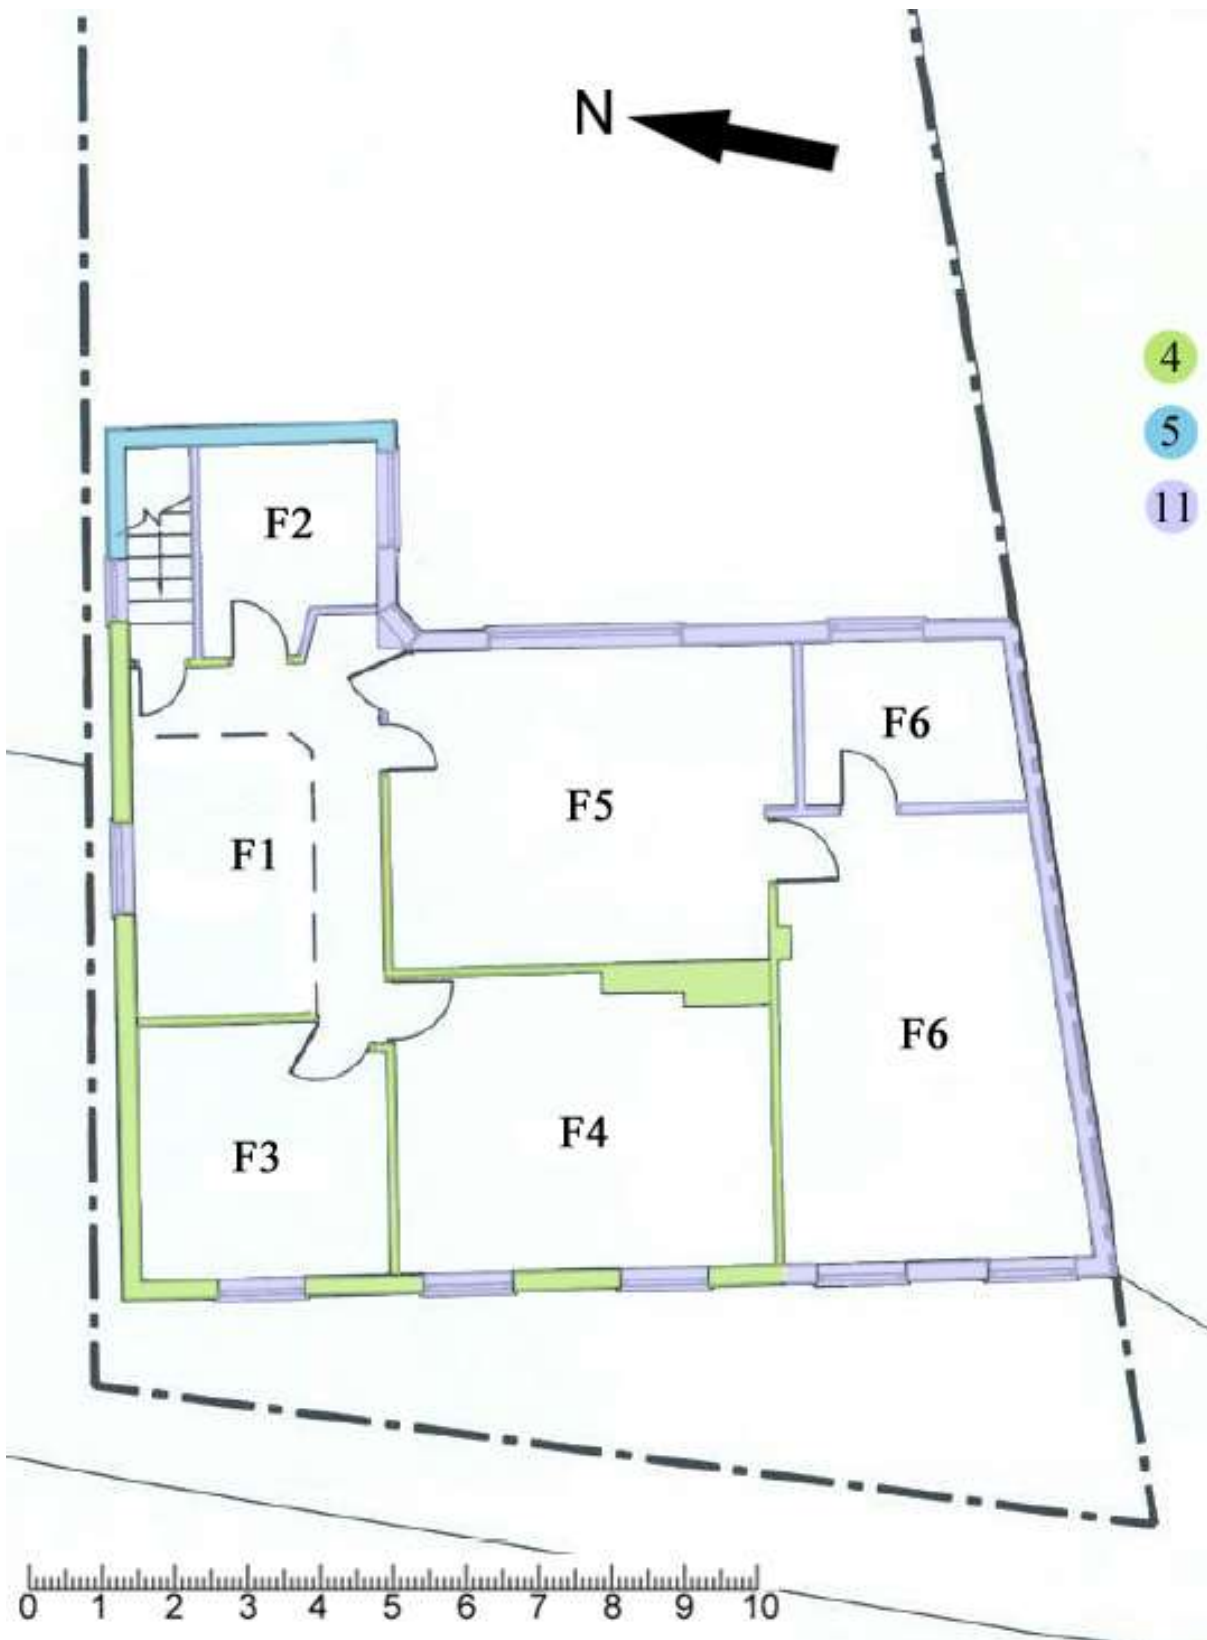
First floor plan of 'The Retreat' showing the three main phases of construction
